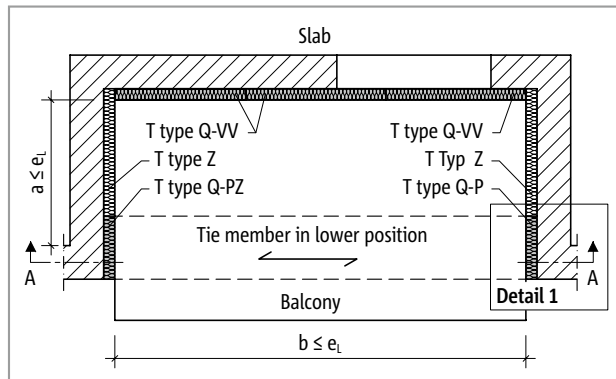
Schöck Isokorb® T type Q-PZ, Q-P: Layout of recessed balcony
